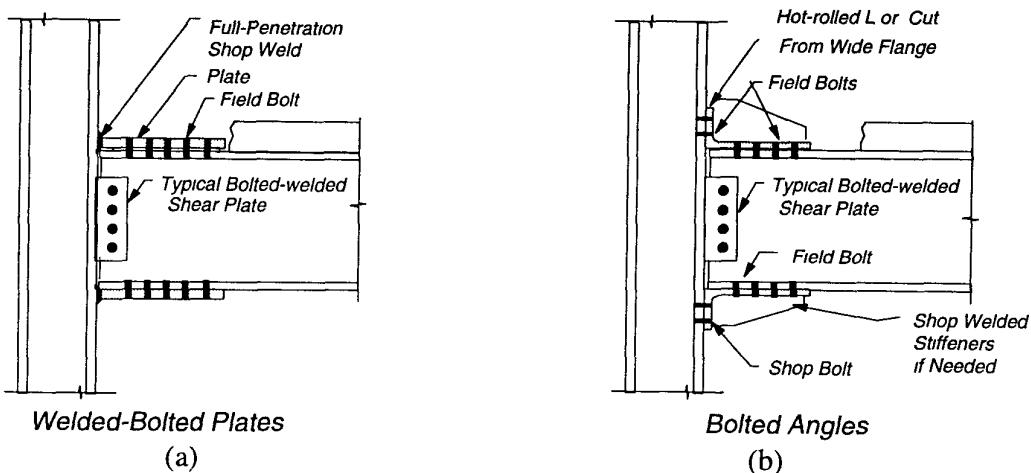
Examples of Field-Bolted Steel Moment Frame Connections
